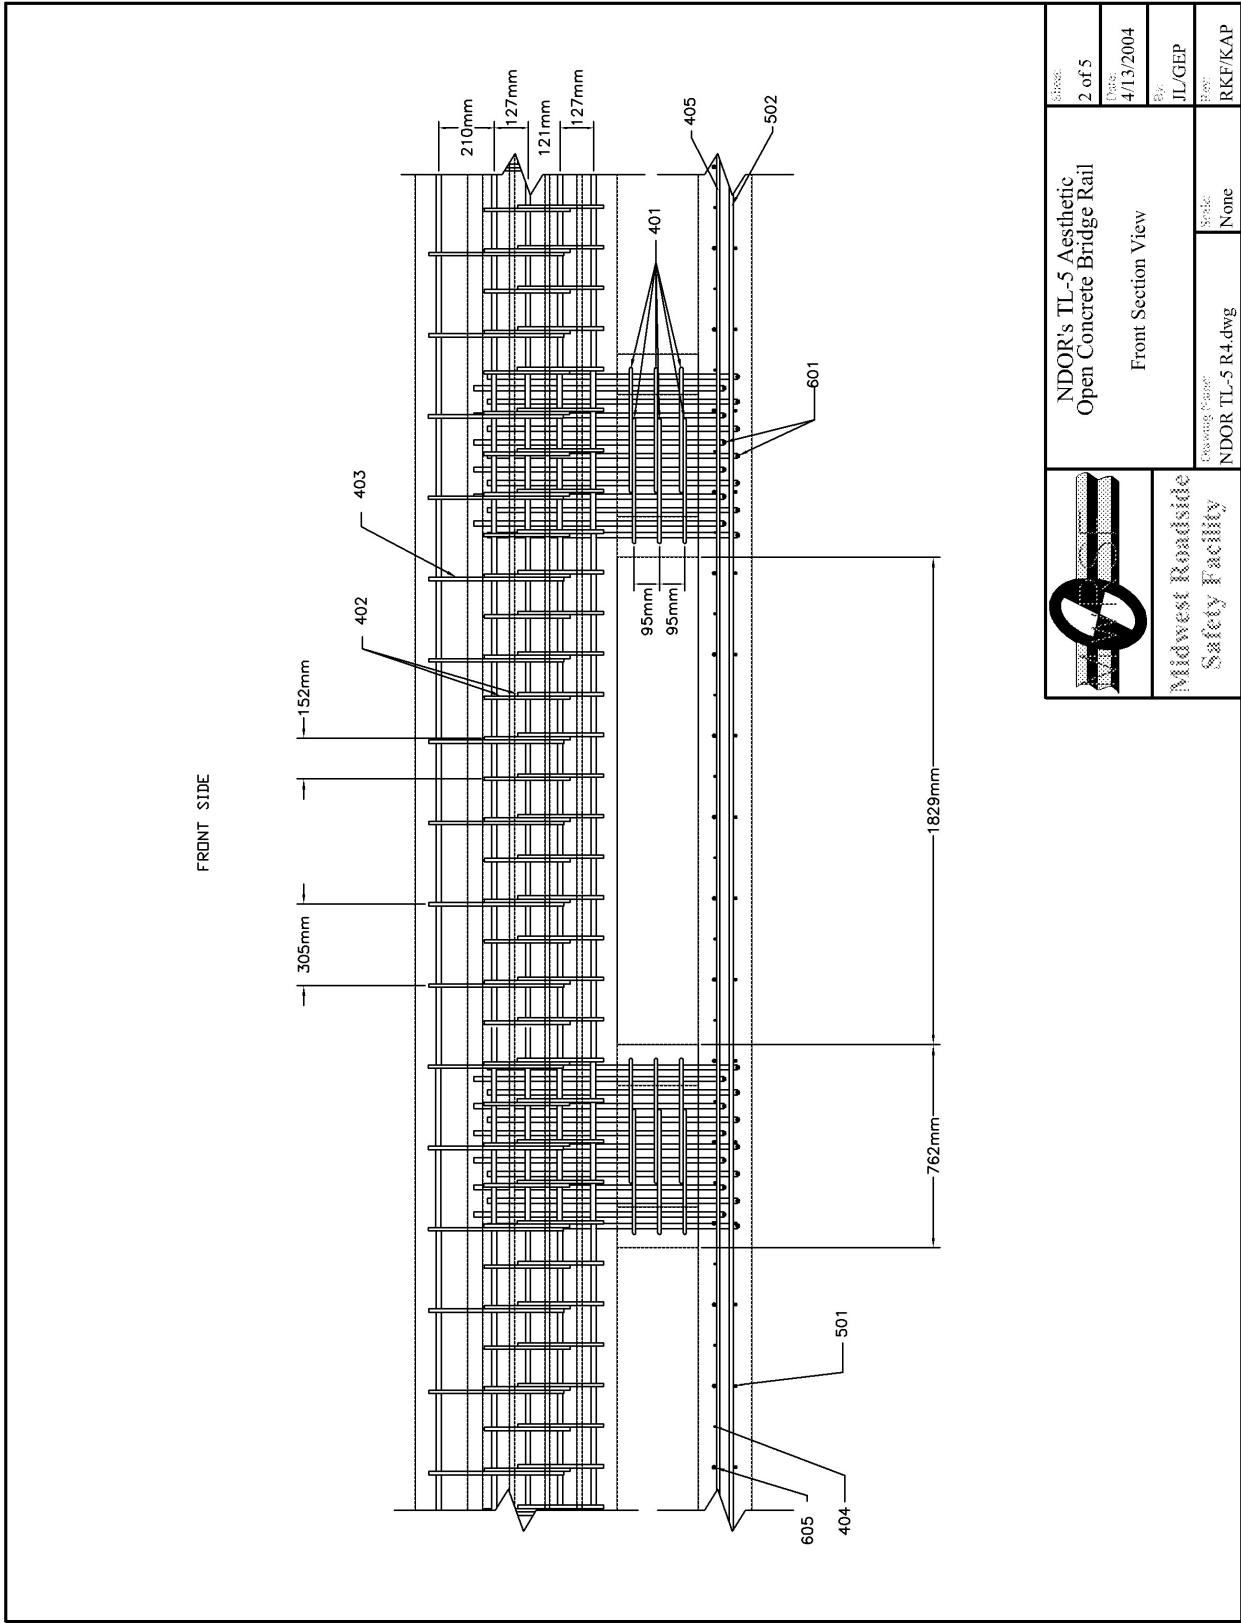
NDOR's TL-5 Aesthetic Open Concrete Bridge Rail Design Details
